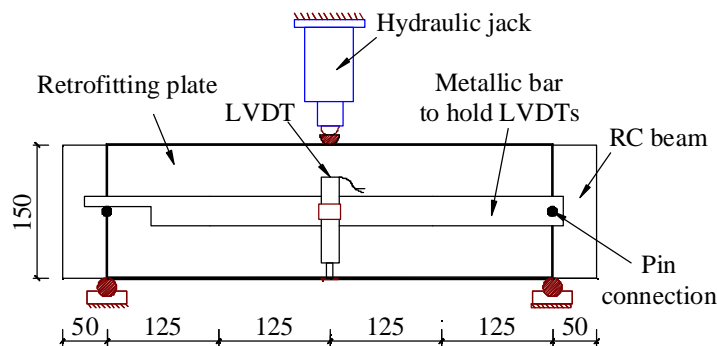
Details of the three point beam bending test setup (dimensions in mm)
